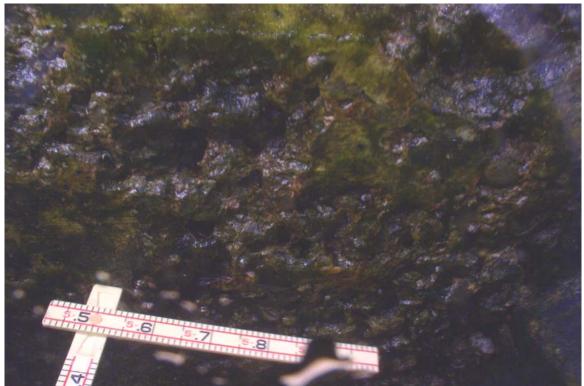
HONEYCOMBING IN UNDERSIDE OF BENT 144 PILE CAP
